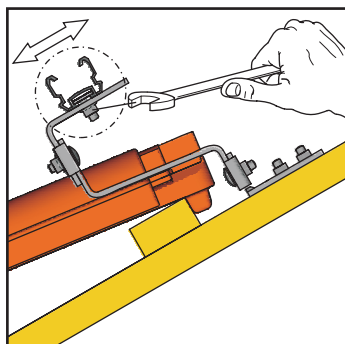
Securely screw the profiles on the on-roof tie top section
